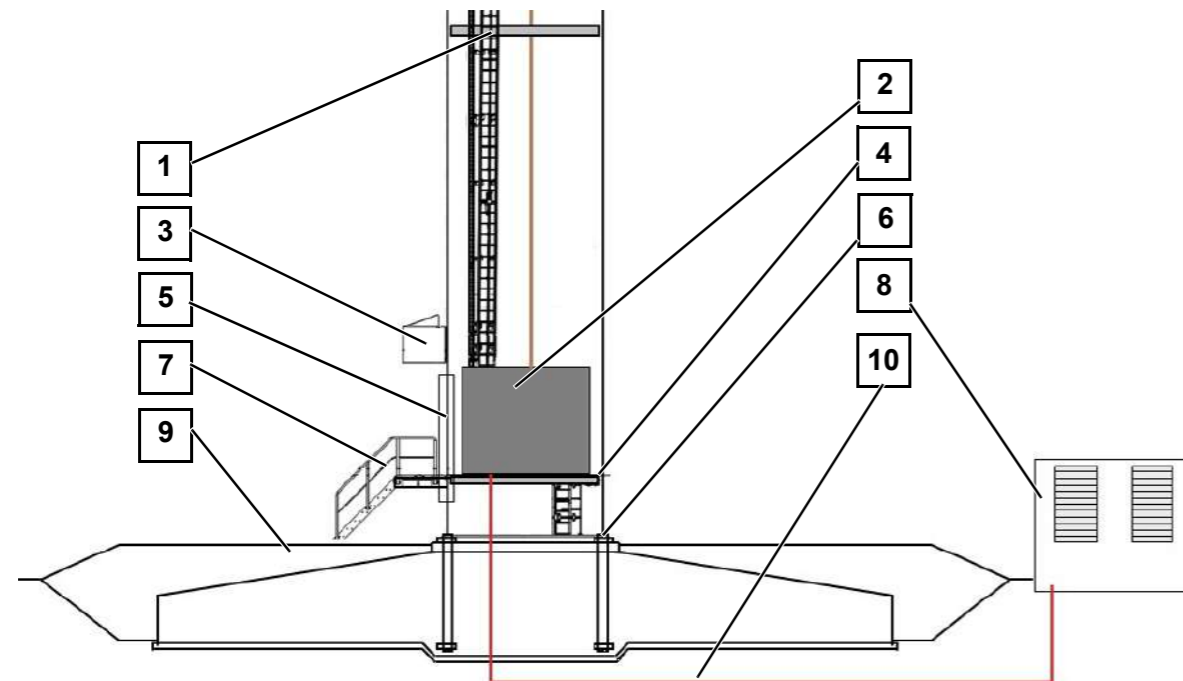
Sectional view of the tower base, variant with transformer outside tower (TAT)
